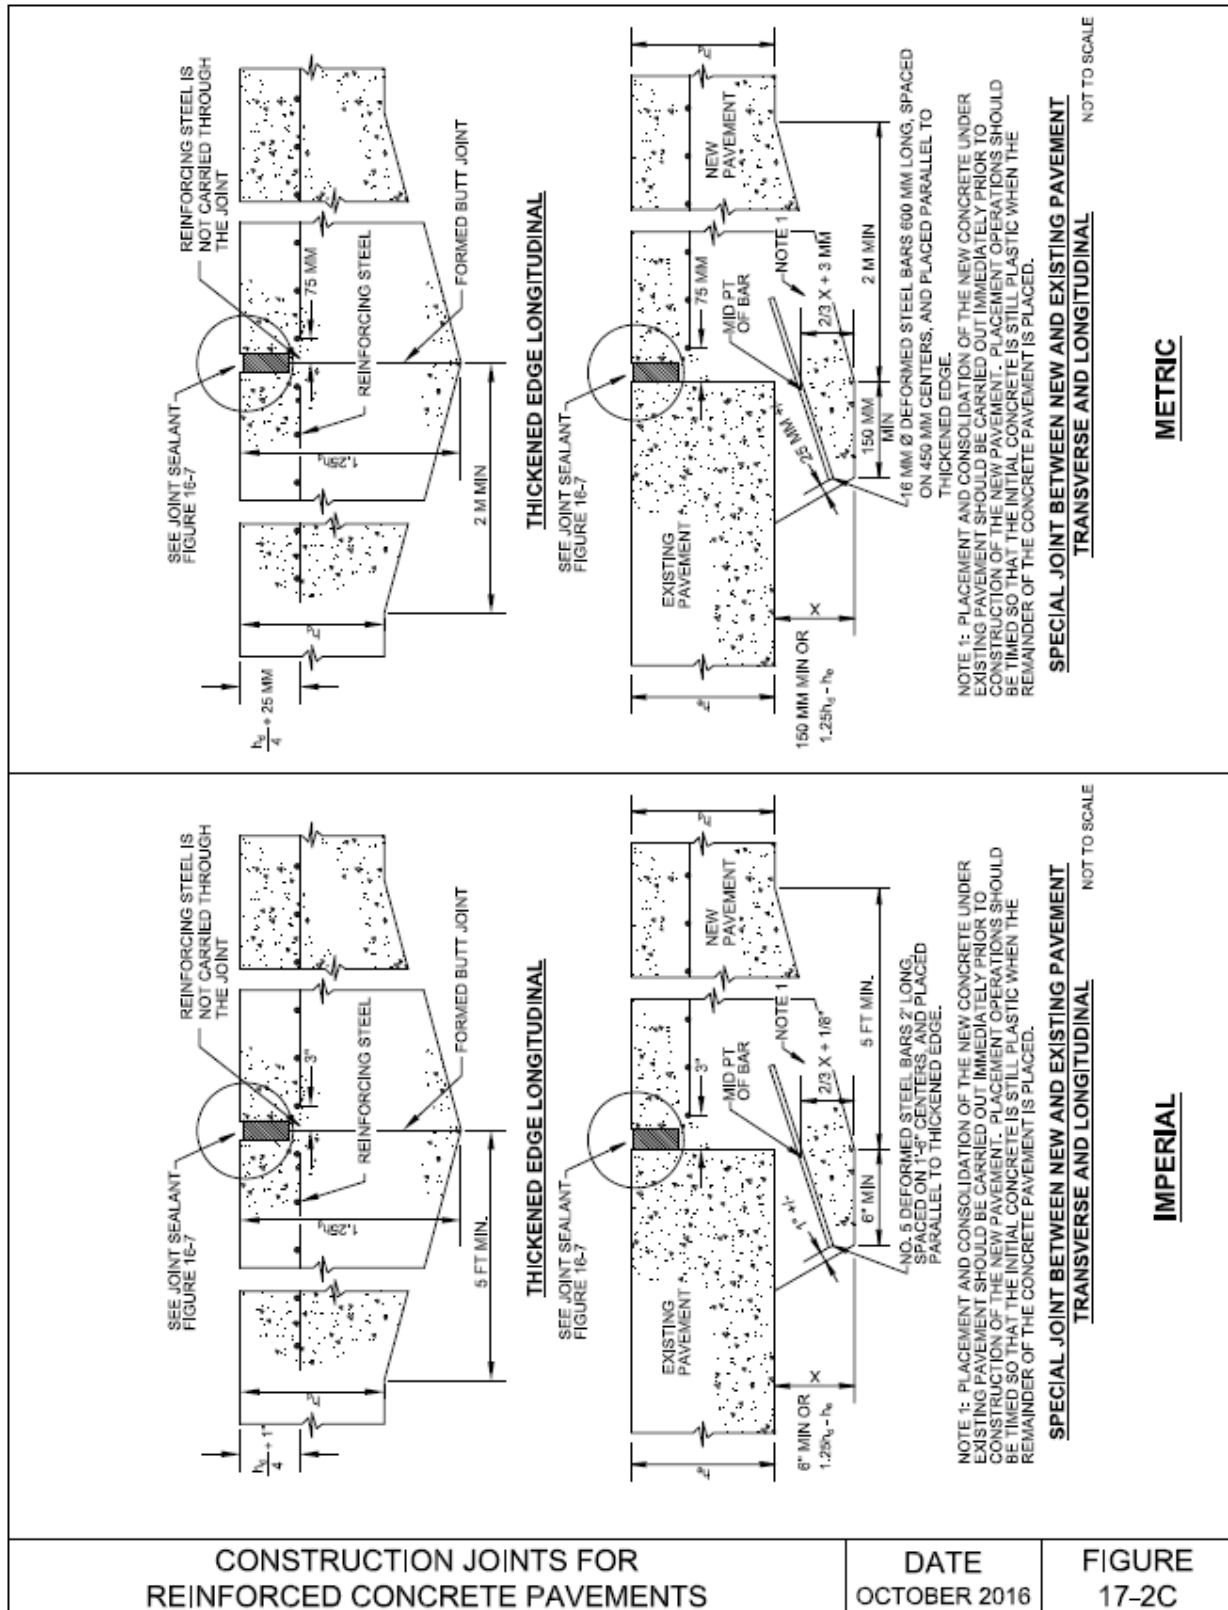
C Construction Joints for Reinforced Concrete Pavements
